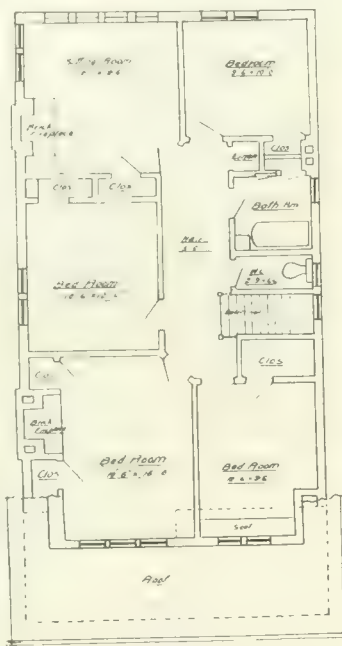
Bedroom floor of house shown in Fig. 6.
